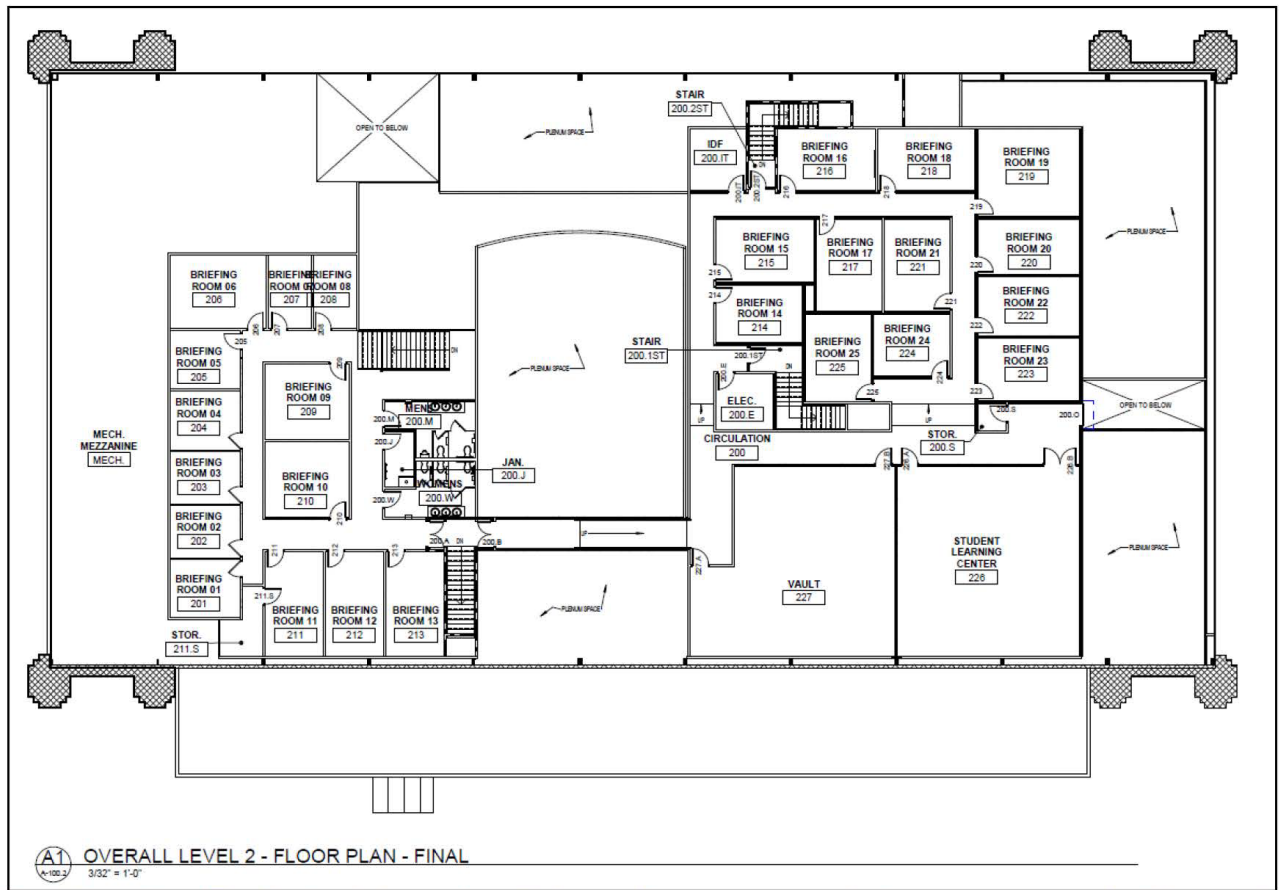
Proposed Second Floor Plan. Note: façade at top of image. No changes would occur to exterior materials or fenestration pattern or materials. All alteration to building interior.
